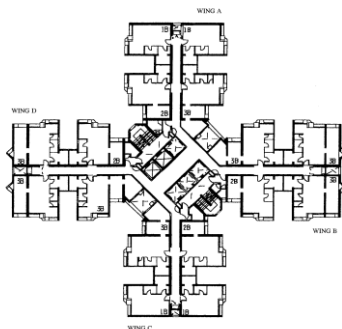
Typical Floor Plan of Shek Pai Wan Estate, HKHA, 2012.
